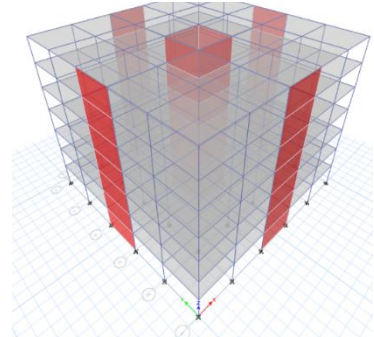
Model 12 - core shear wall at center with walls at periphery in two directions
